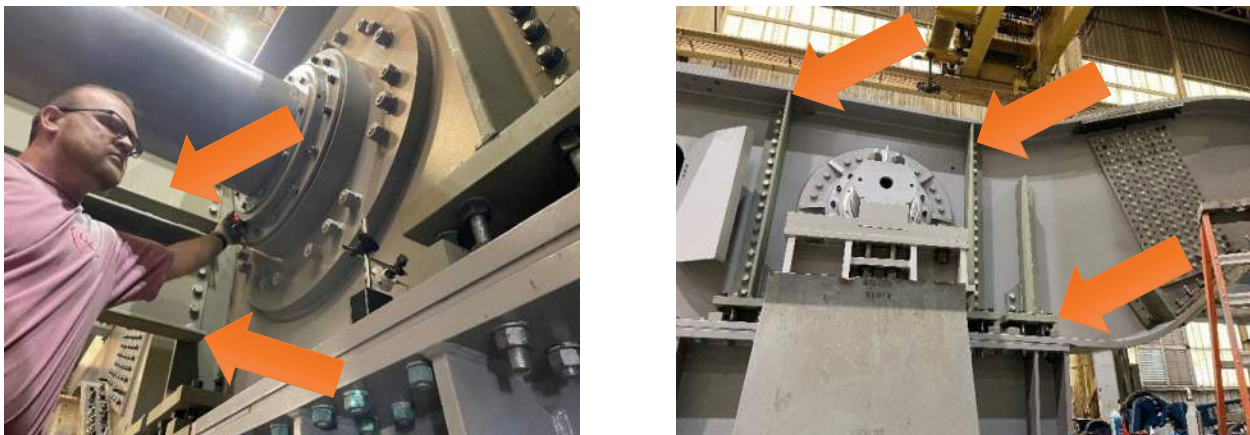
Stiffeners bolted to the girder web (Right) and channels running from girder to girder (Left) indicated by orange arrows.
